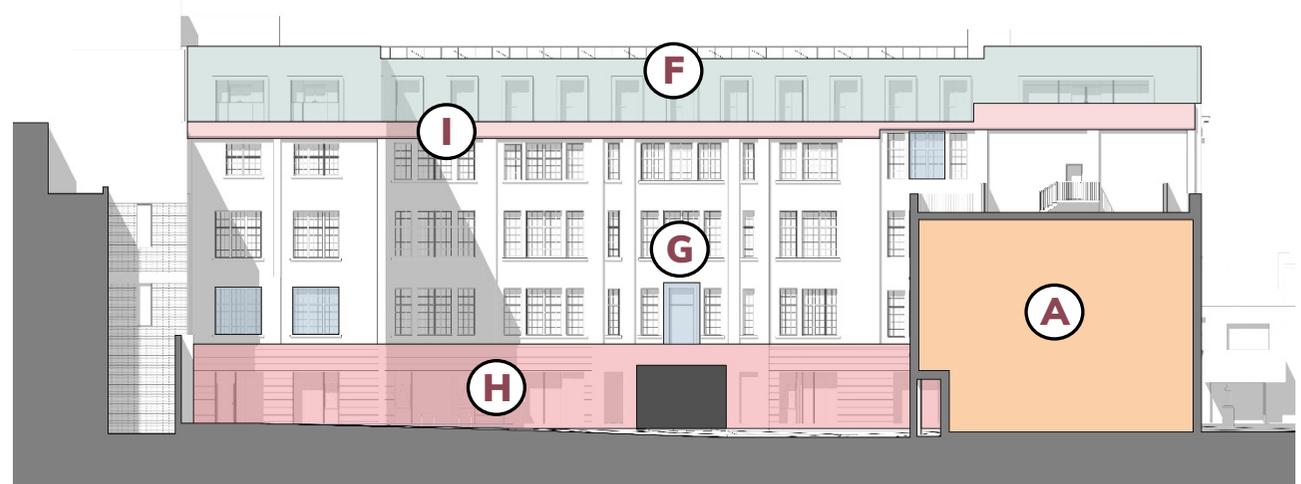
Proposed Alterations & Additions, Courtyard Façade, Sorting Office
